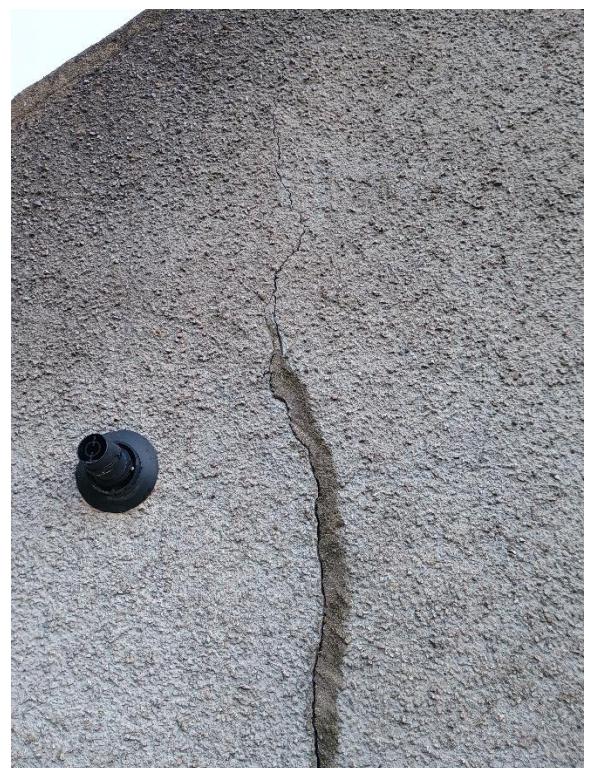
Location of external crack on gable wall of the original building.
